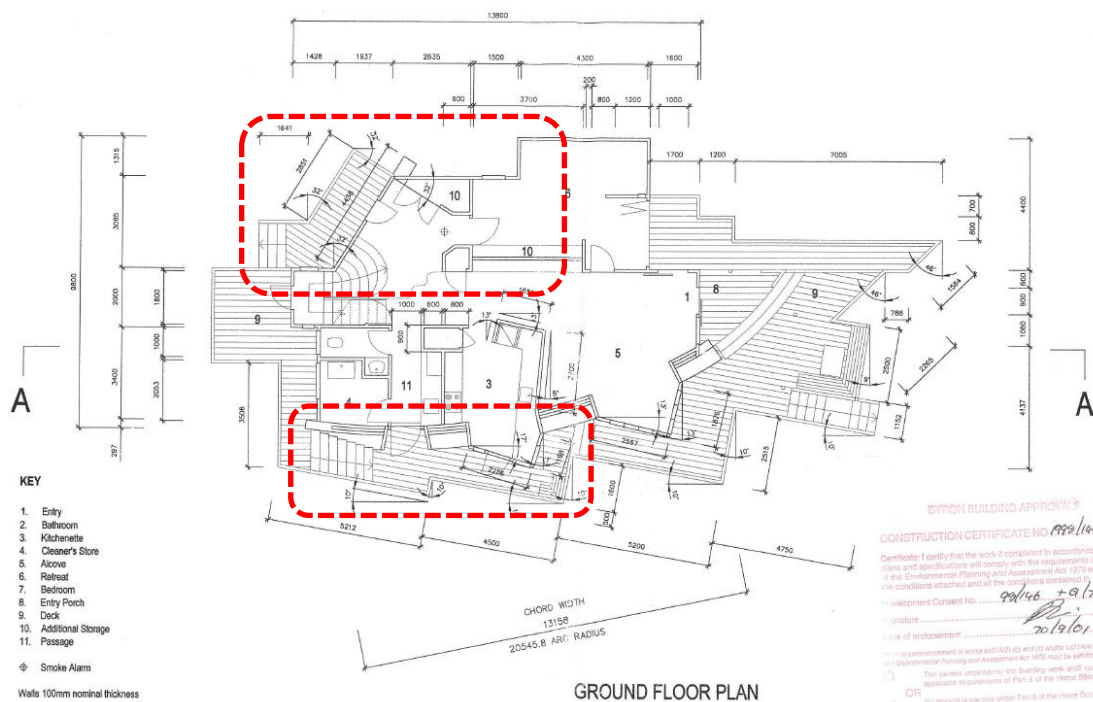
Extract from "Type A" ground floor CC stamped plans (11.1998.146.1)
